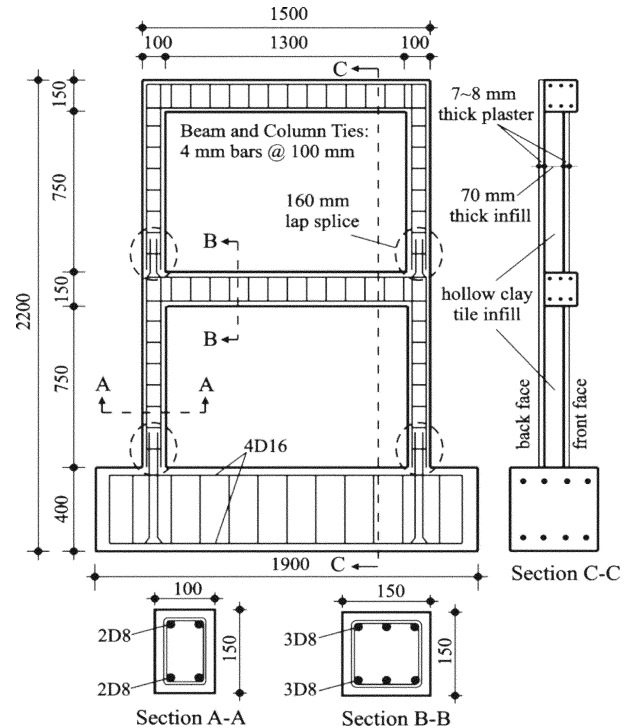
Details of test specimens. (Note: Dimensions in mm; 1 mm = 0.0394 in.; nominal diameter of bars: D4 = 4 mm, D8 = 8 mm, and D16 = 16 mm.)
